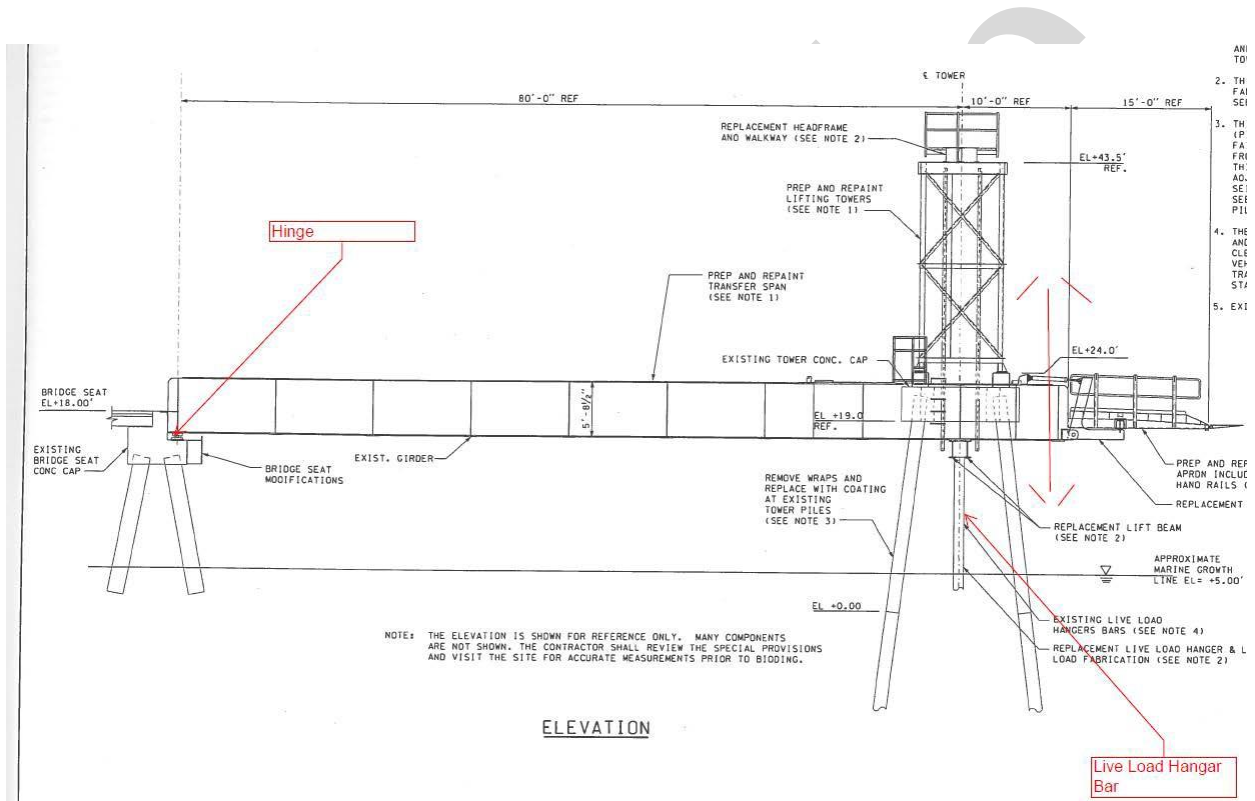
Loading Bridge Elevation with Hanger Bar Labeled.
